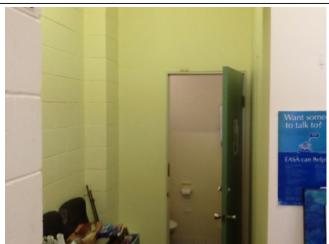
NT0554-327 Result: Asbestos - Positive Building/Level: Main Building - Anglicare-Ground Level Room/Location: Toilets-Throughout Feature/Material: Wall Lining-Insulating Board
